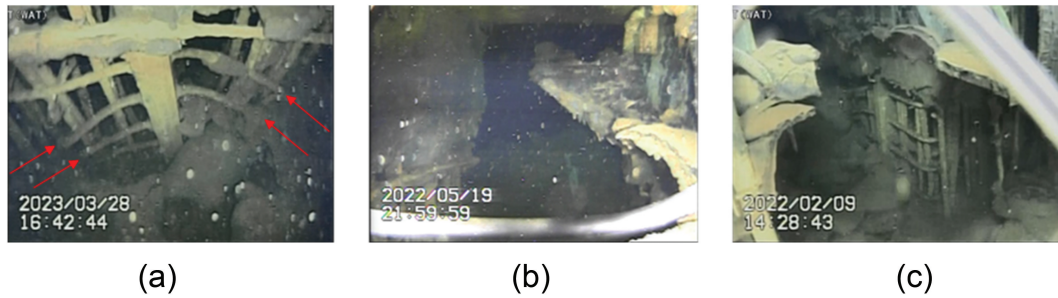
State of pedestal opening. (a) Left wall with exposed inner skirt and rebar. (b) Upper part with shelf deposit. (c) Outer right corner with exposed rebar and shelf deposits. Red arrows are pointing to bent rebars.
